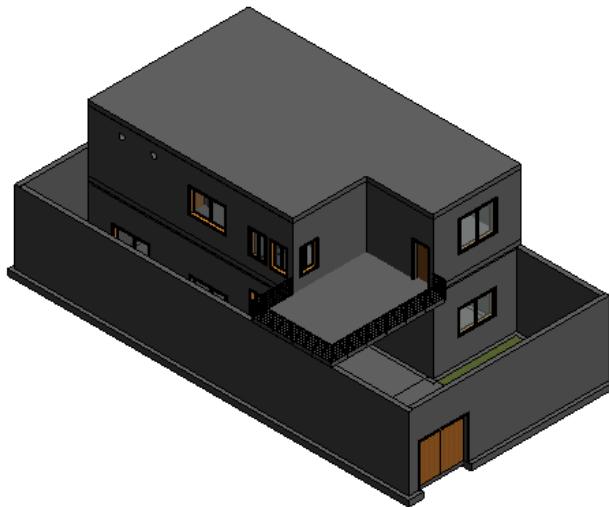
3D view of Concrete Insulated Sandwich Panel Building
